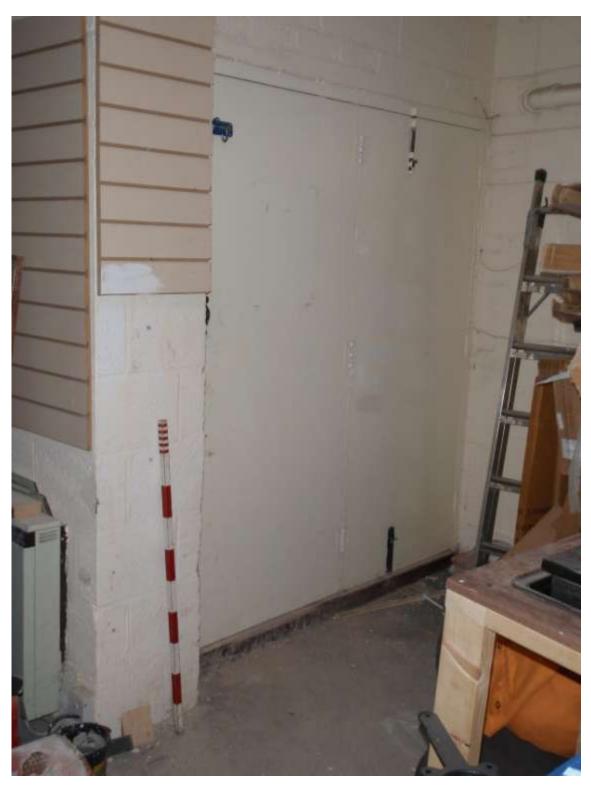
View of interior of north building showing modern concrete floor, modern blockwork and part of the original brick wall on the right.
